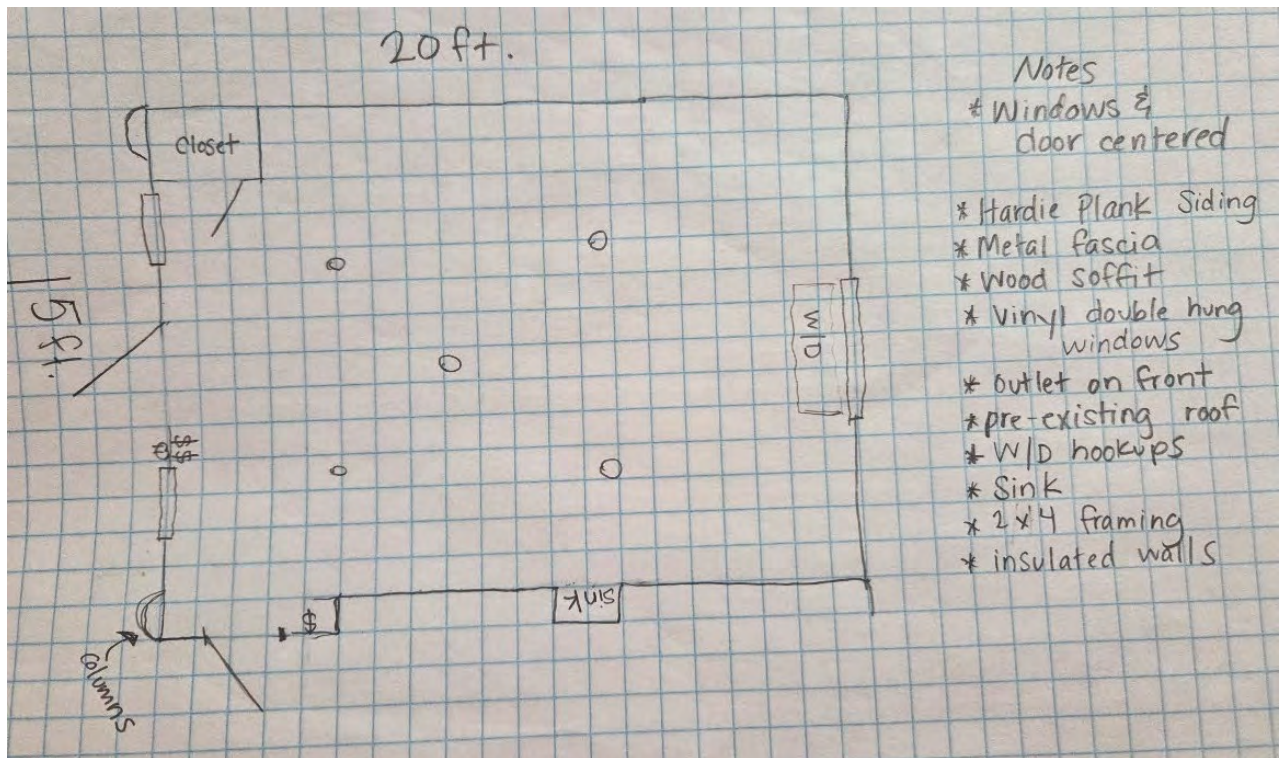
Sketch Floorplan for *porte cochere* Mudroom Conversion
